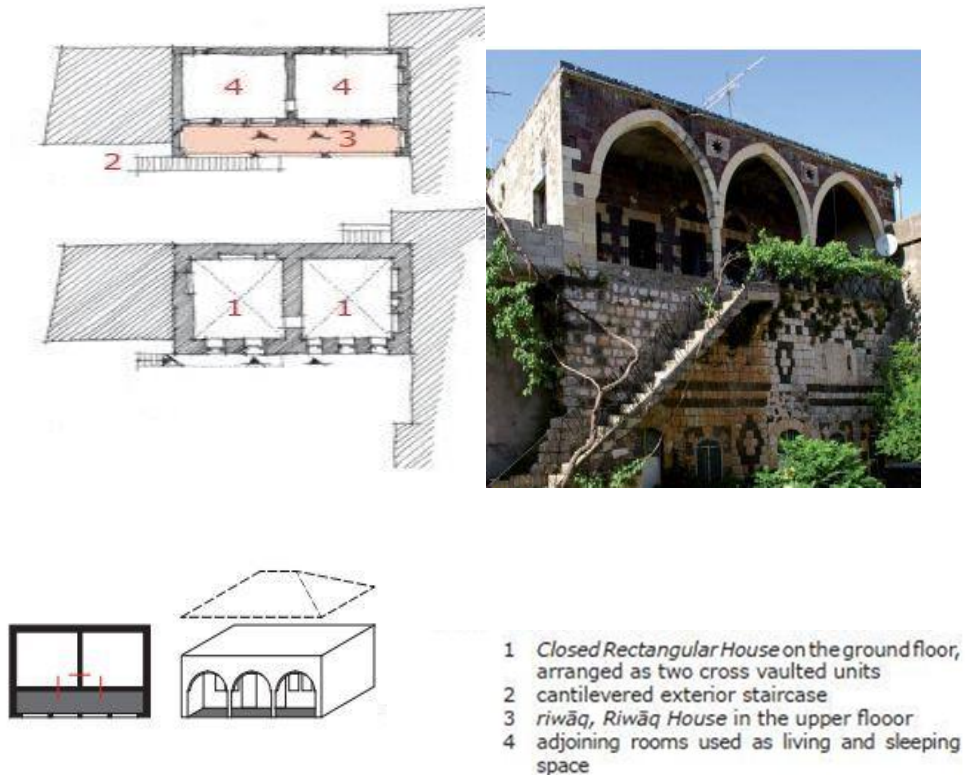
Plans and elevations of Riwāq house. Source: M. Wesam AL ASALI, Iyas SHAHI. Date: 2016.
